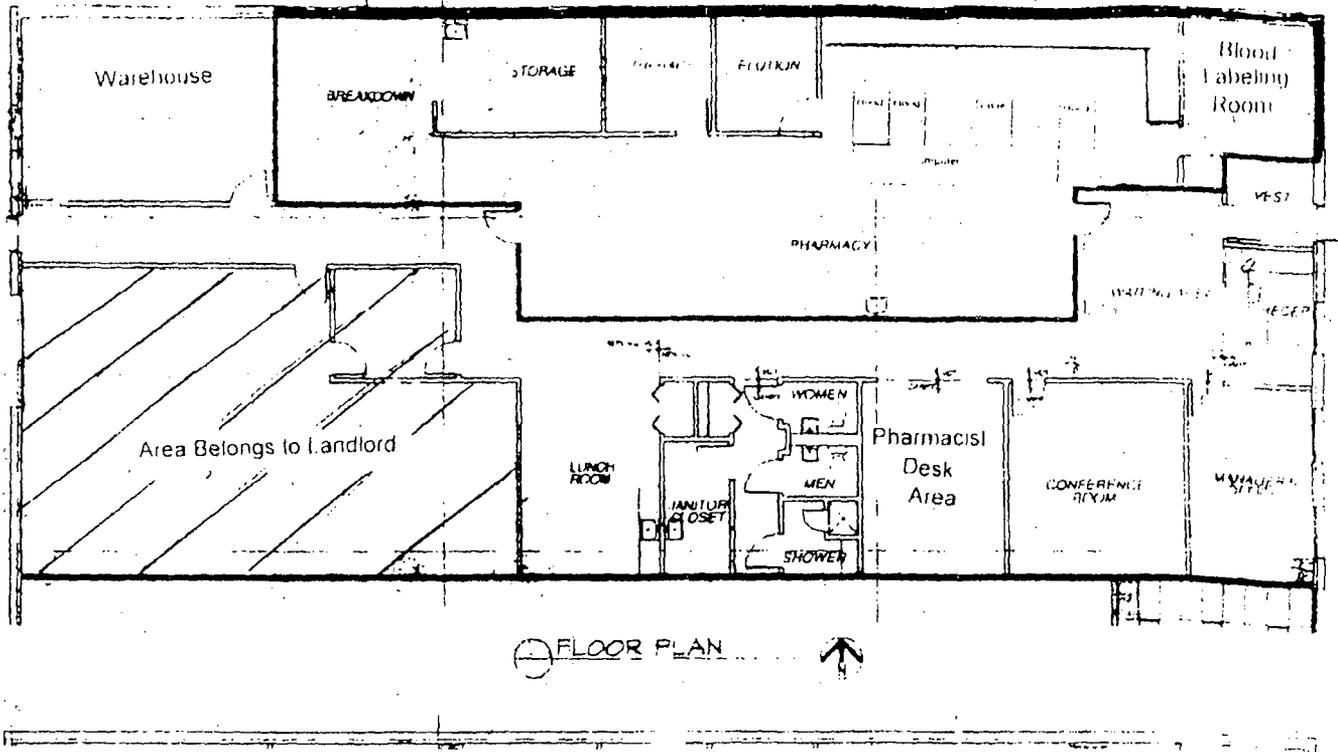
Facility Floor Plan The restricted area is outlined in black.
